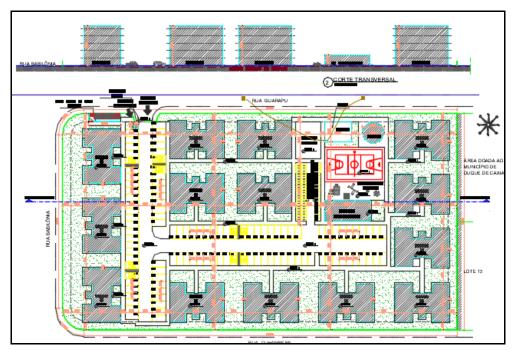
Proj. B (D. Caxias) Master Plan, cross section.
